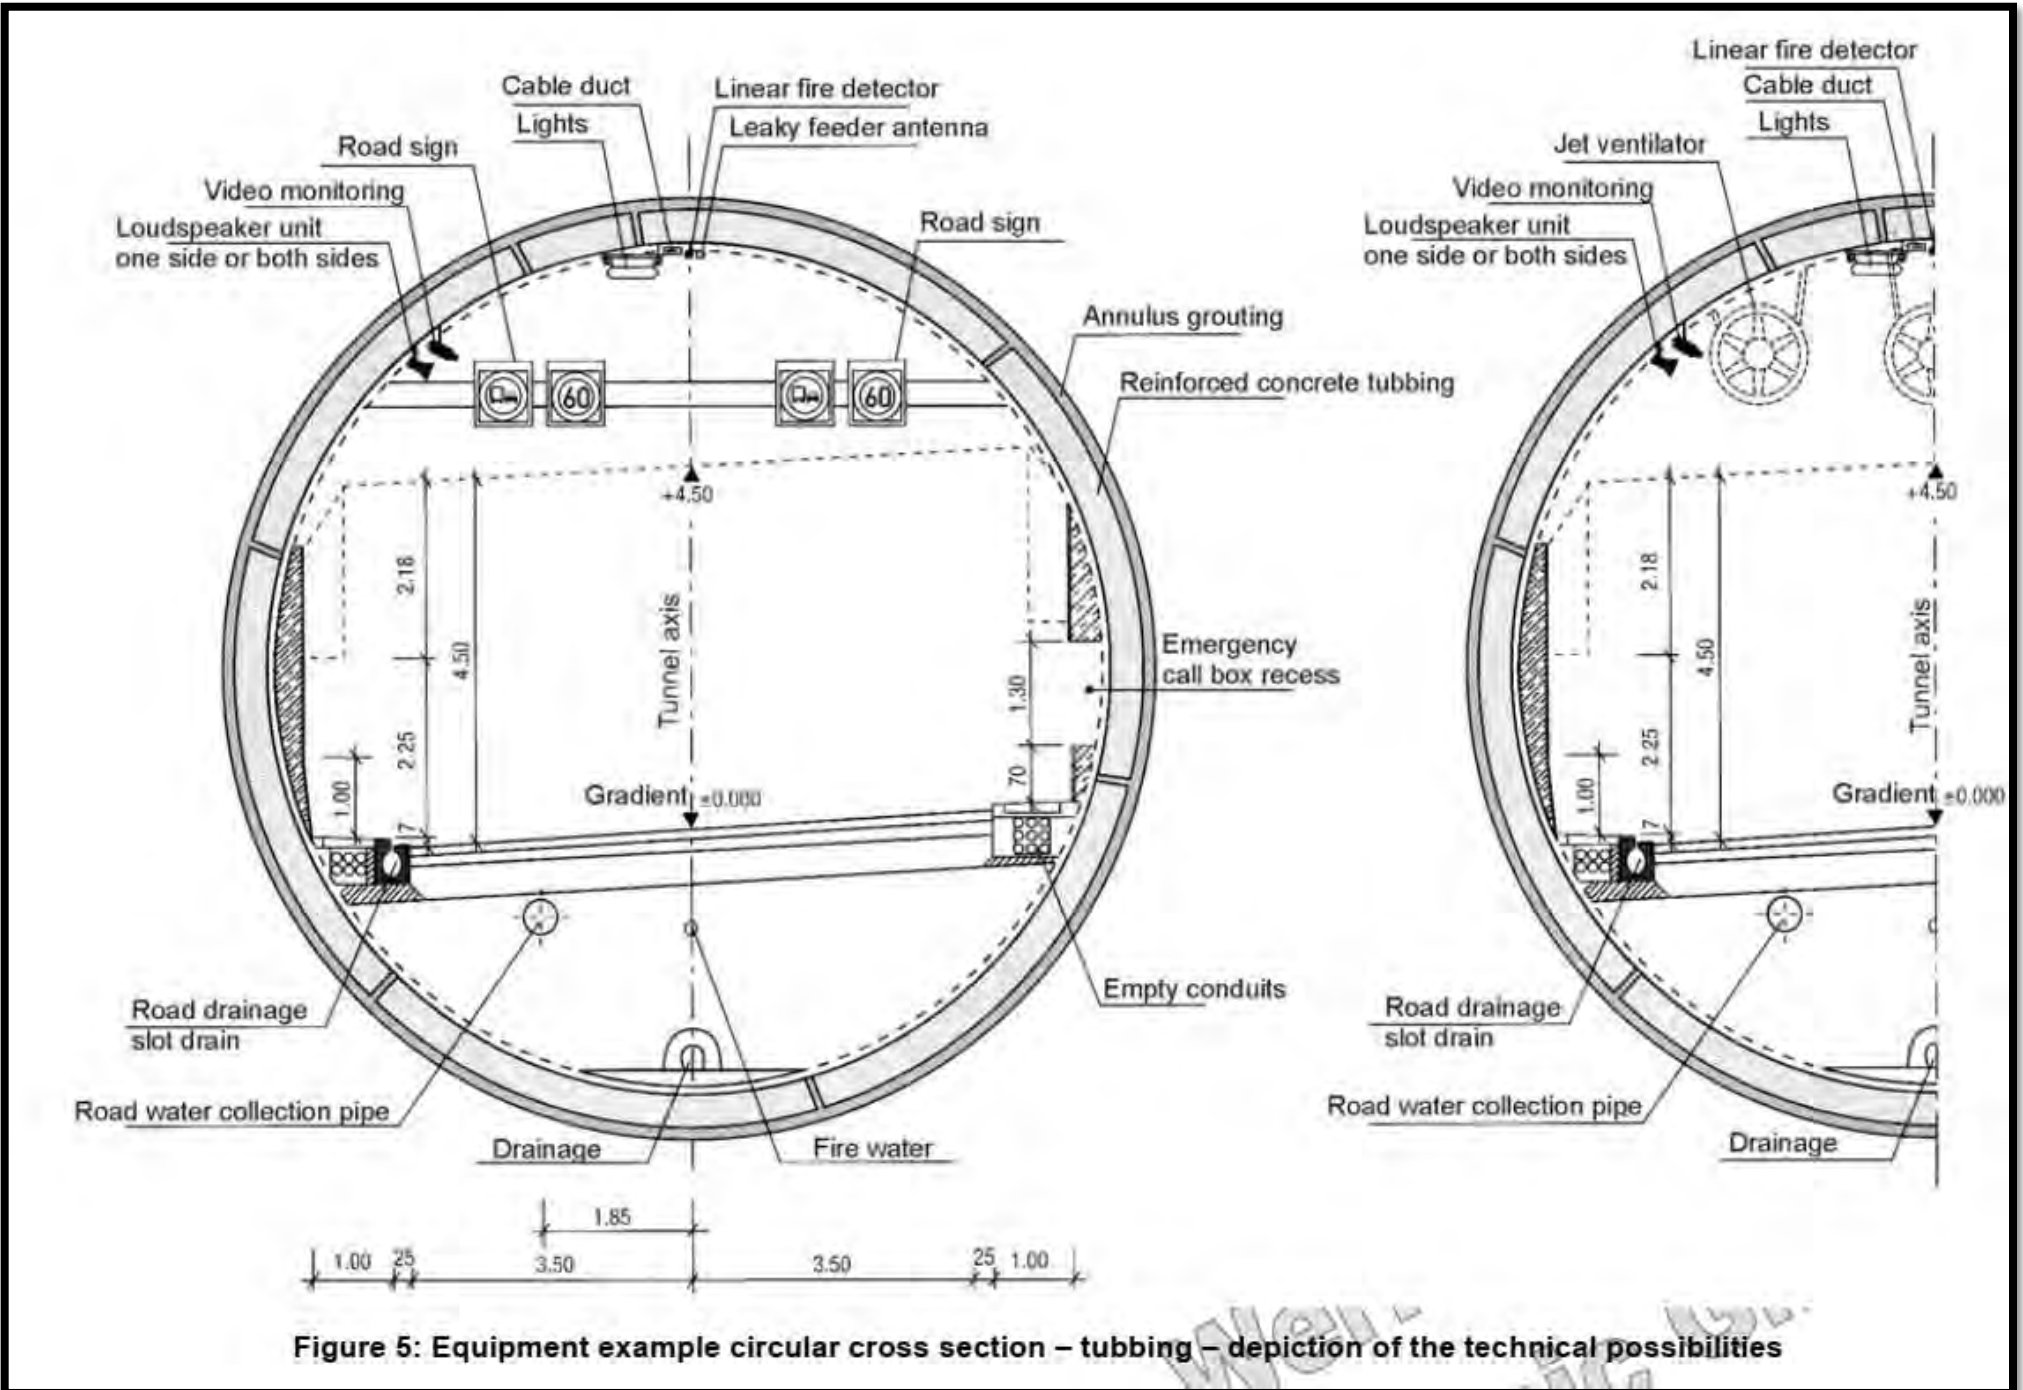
Equipment example circular cross section – tubing – depiction of the technical possibilities
